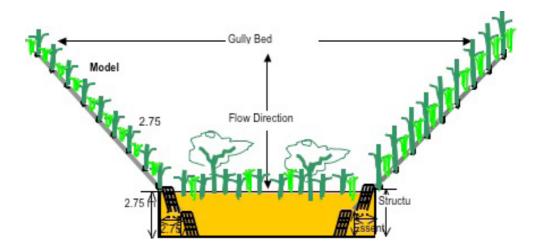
Cross-section of a typical gully, showing how both walls and bed can be stabilised.
